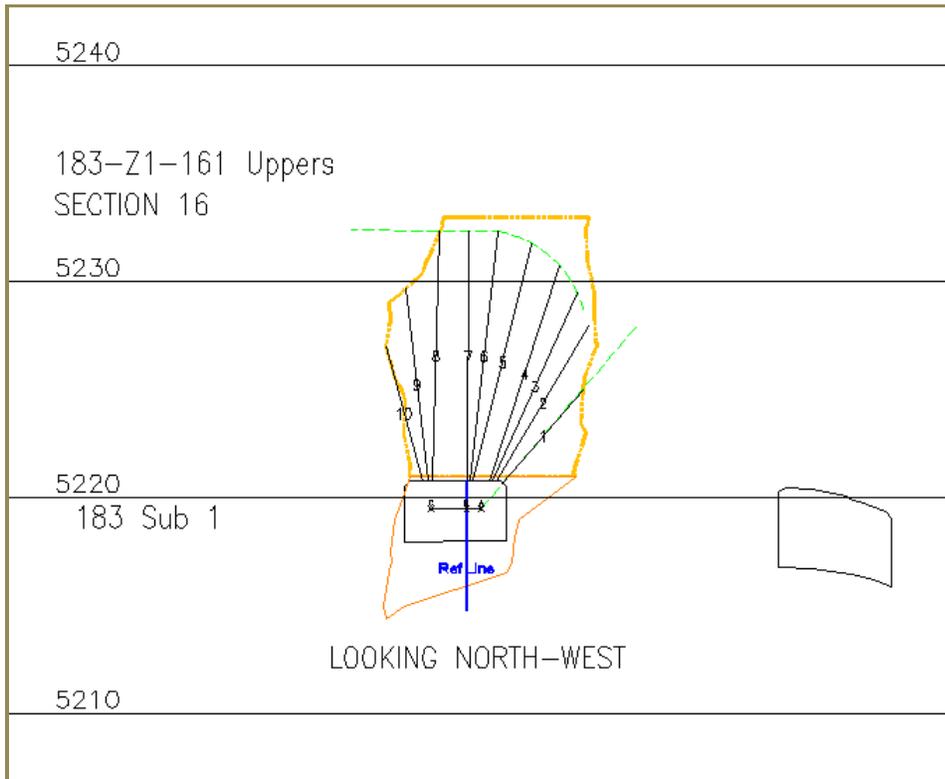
Typical Upper Ring Layout 183-Z1-161
